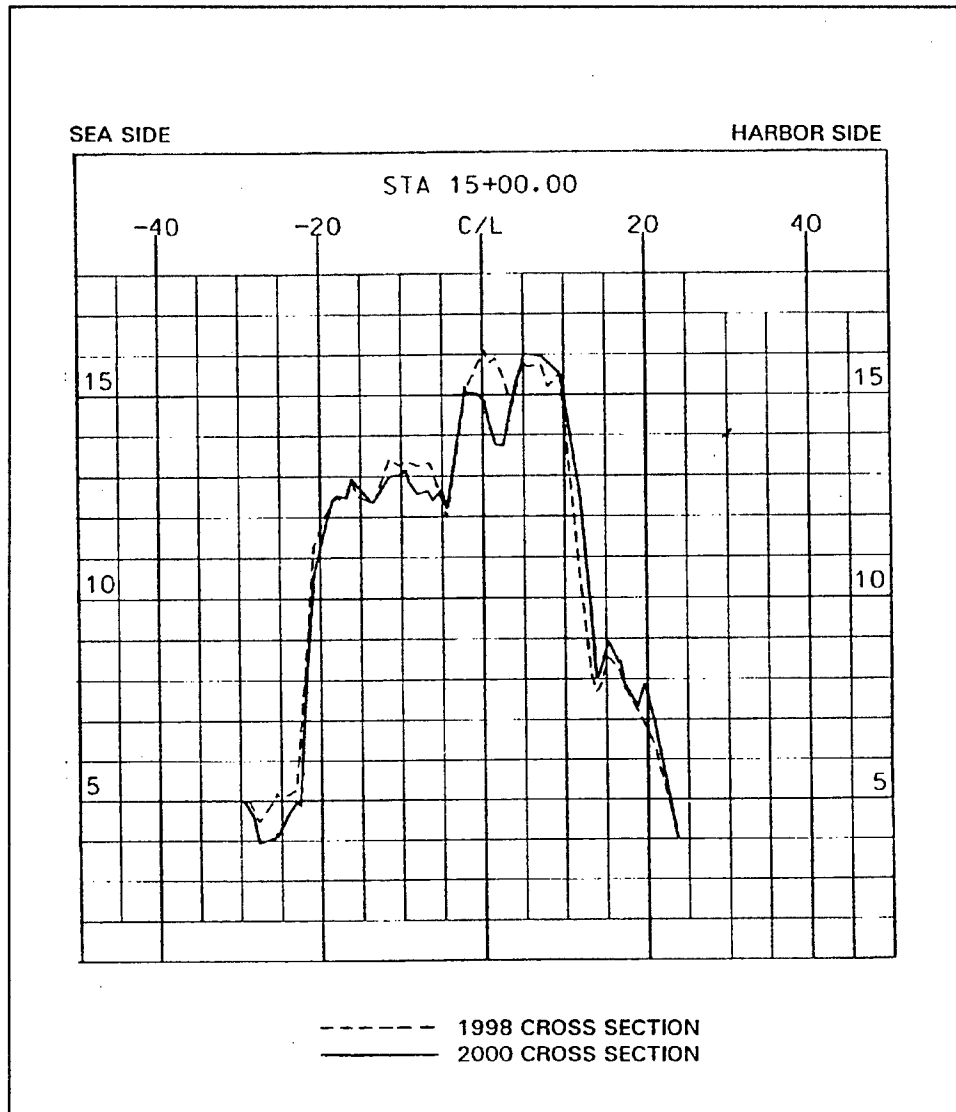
Cross sections of Morro Bay outer south breakwater, sta 15+00
